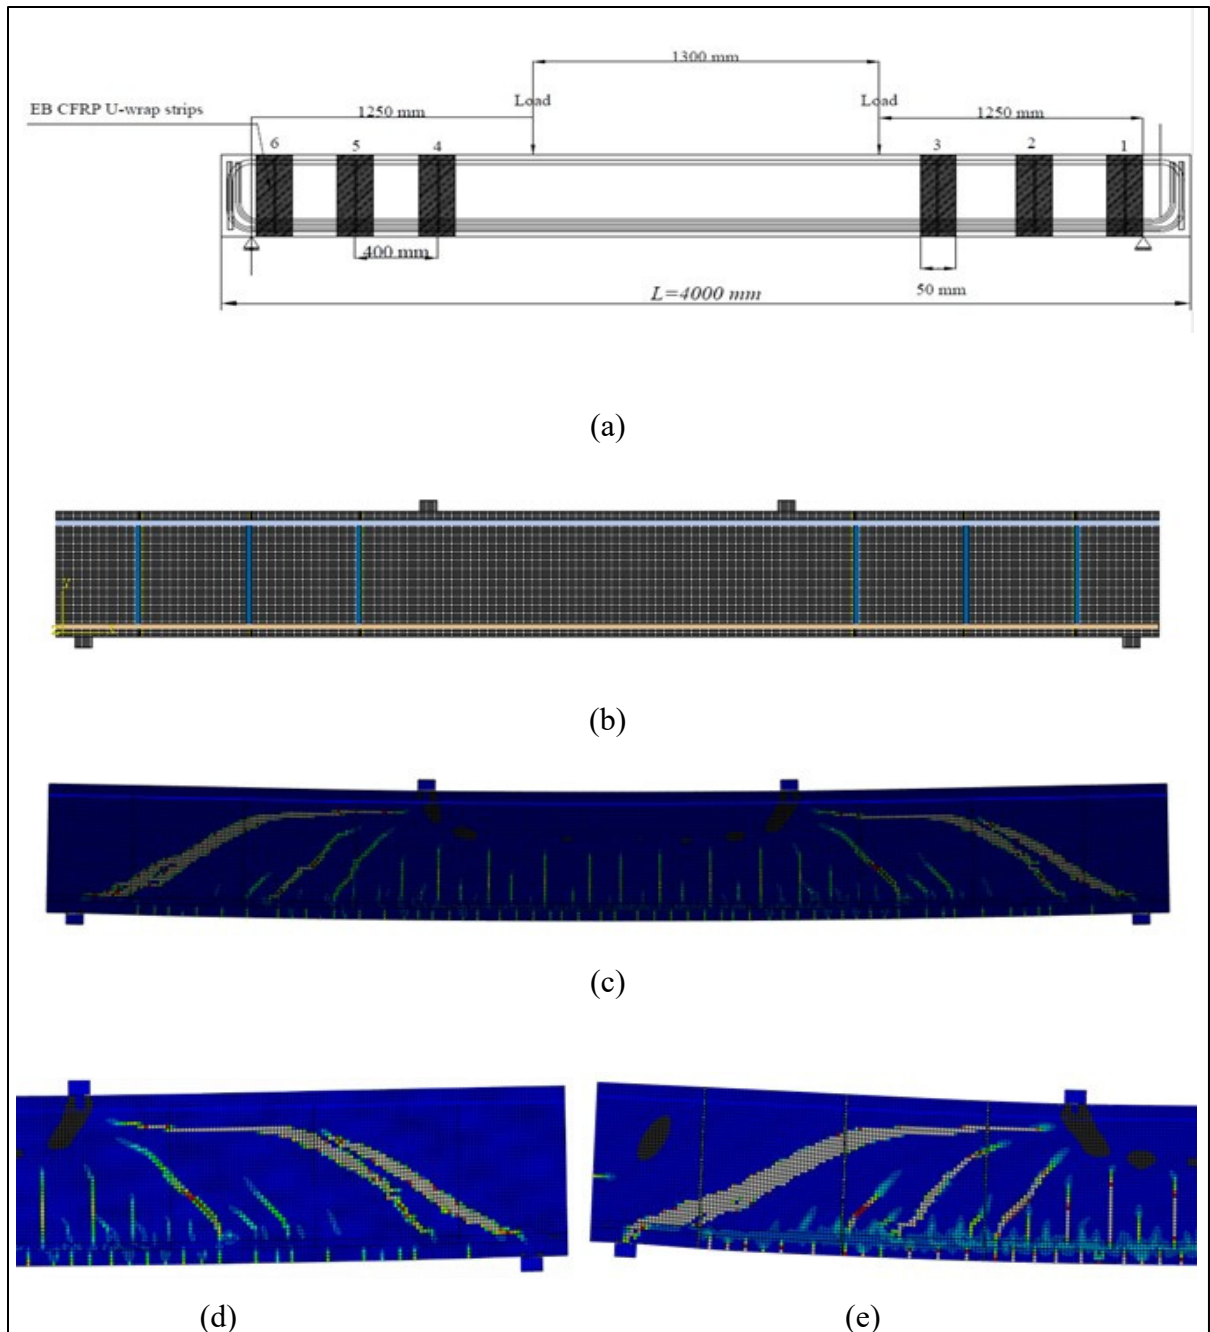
(a) elevation of rectangular specimen for parametric study (b) Schematic of two-dimensional simulated and analyzed RC beam strengthened in shear with EB-FRP under four-point loads (c) shear cracks in control beam (d) shear crack pattern in control beam at ultimate state (e) shear crack pattern in strengthened beam with EB-FRP at ultimate state
